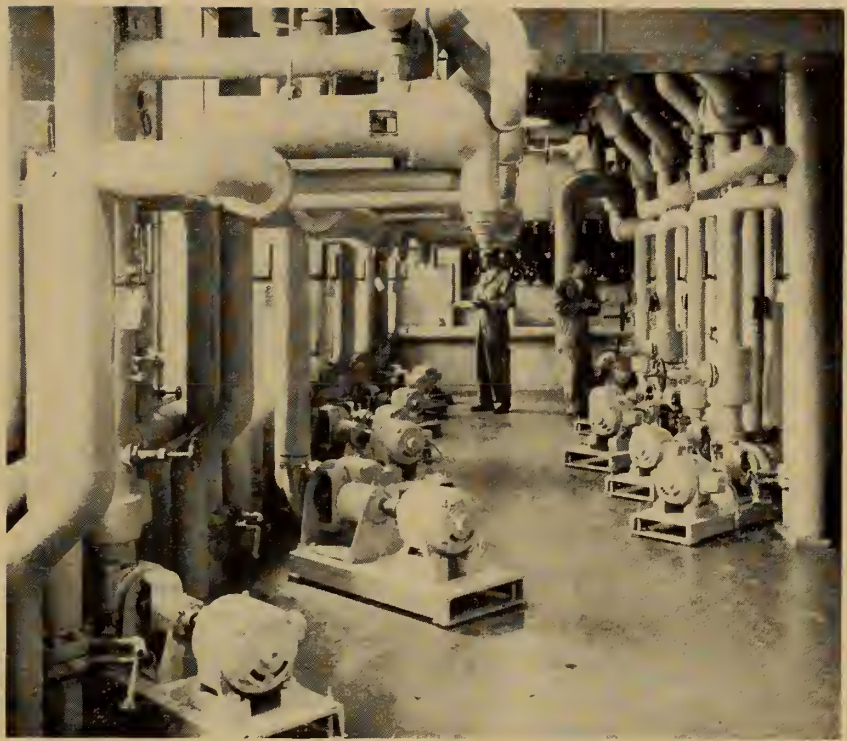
Heat exchangers, pumps and control valves on 11th floor equipment room of Manufacturers Life Building.
